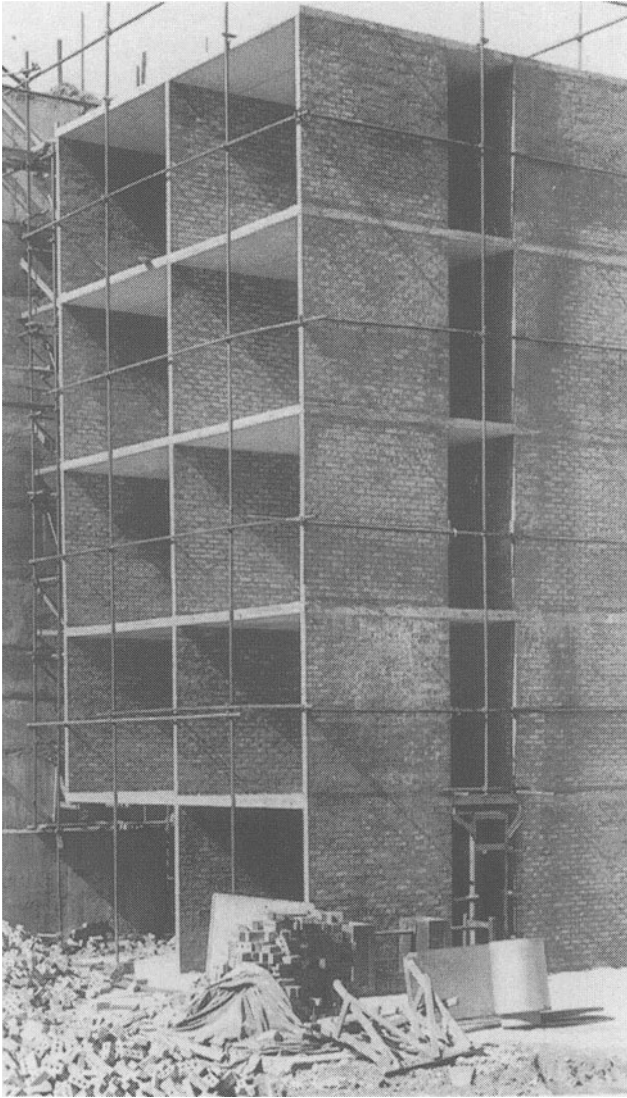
Wall removal test on five-storey brickwork structure simulating accidental damage
